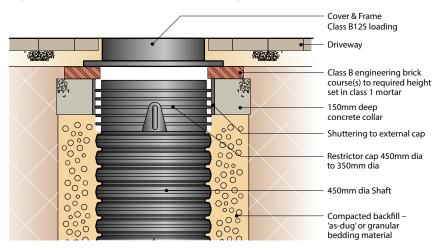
Installation detail for B125 loading: paved areas with limited traffic load
